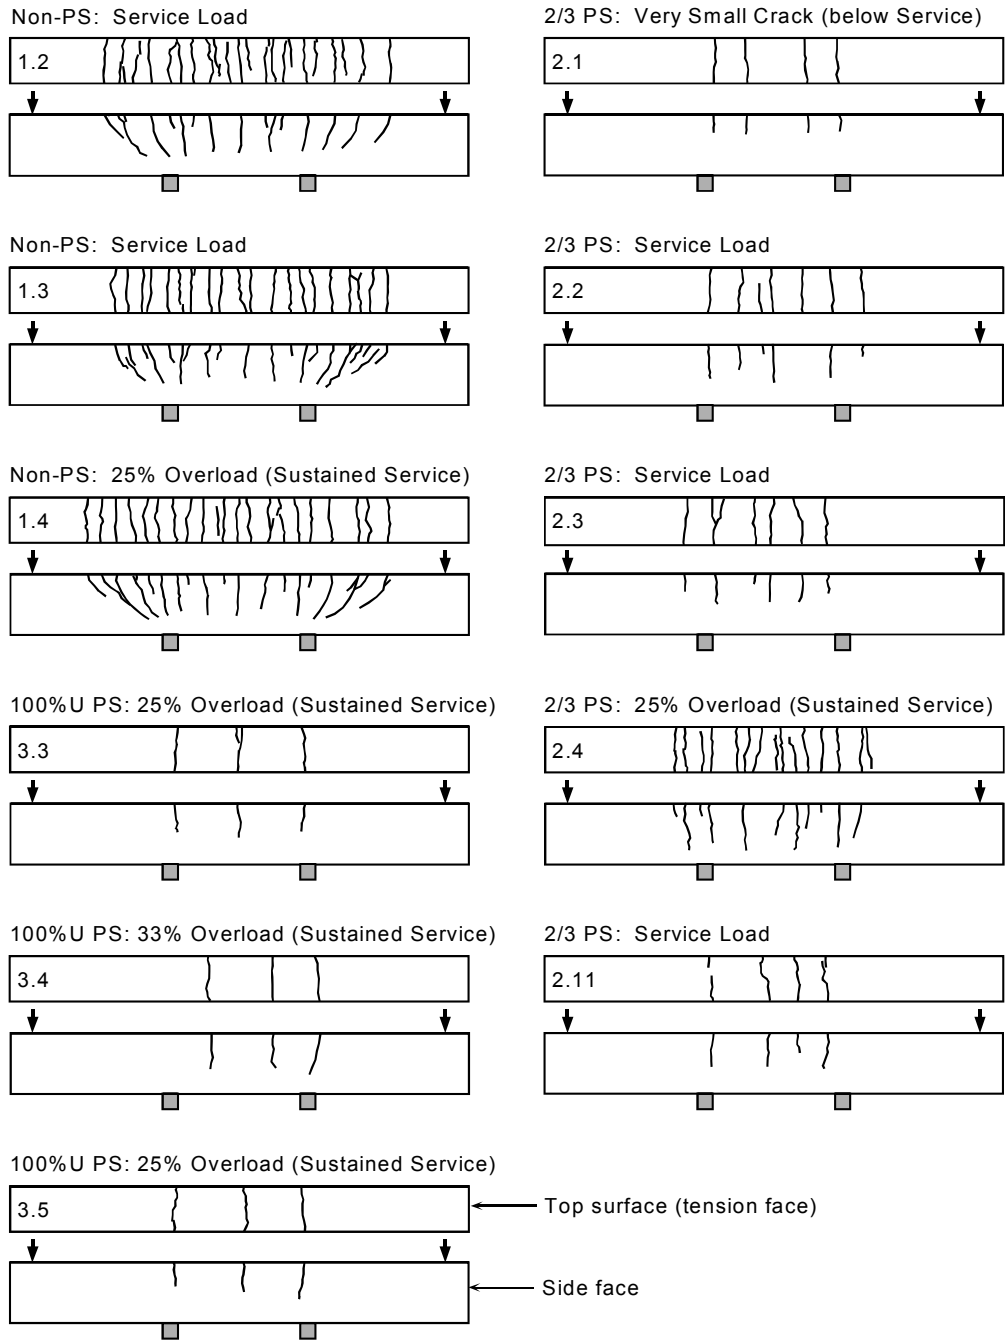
Phase I Beam Specimens Crack Patterns^{4.2}
